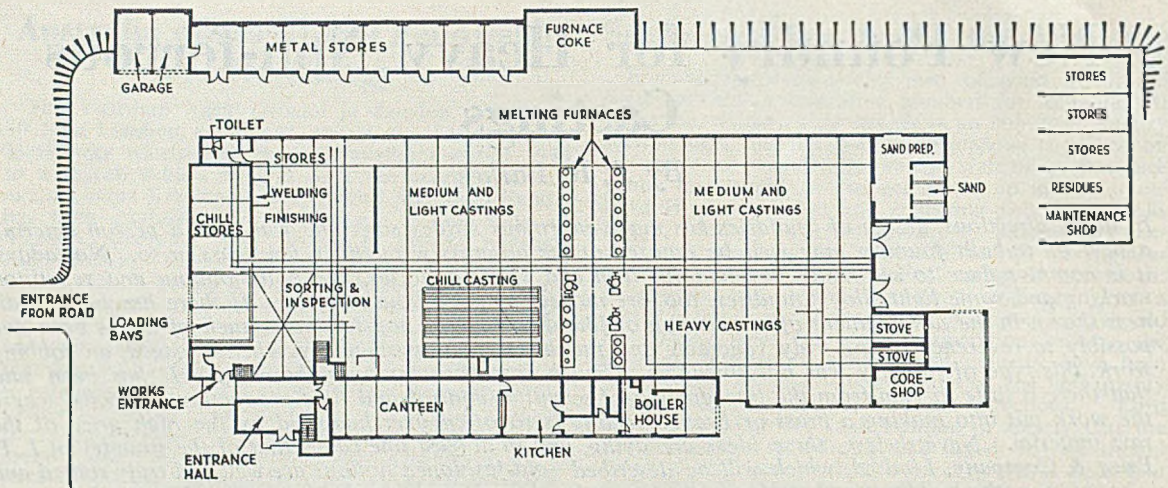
Ground-floor Layout of the New Foundry. On the First-floor, a Patternshop is built over Stores and Loading Bays; General and Executives' Offices over the Canteen and Kitchen; Ablution Rooms over the Boiler House and a Patternstore over the Sand-preparation Plant. Note the well-separated Metal Stores.
